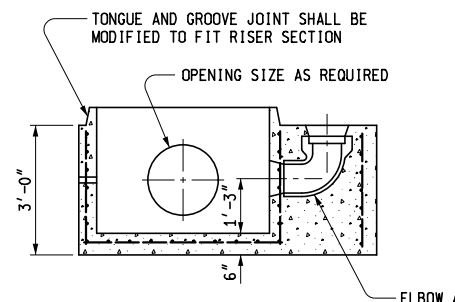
'-4" & 2'-0" TOP SECTIONS
